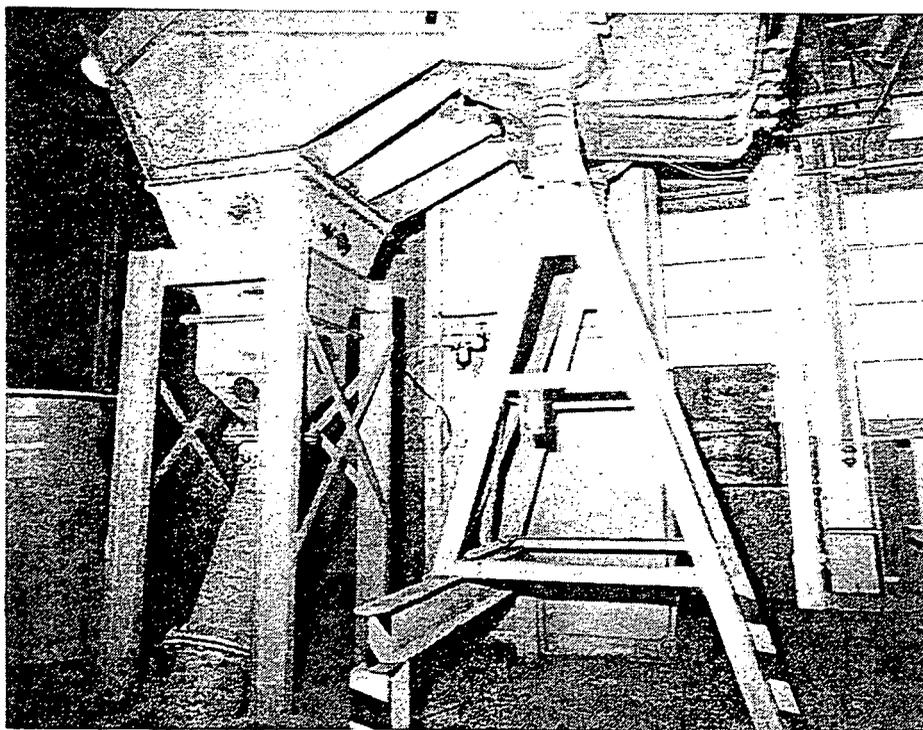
Building 1A - Grizzly Feeder, NE Corner, Third Floor
